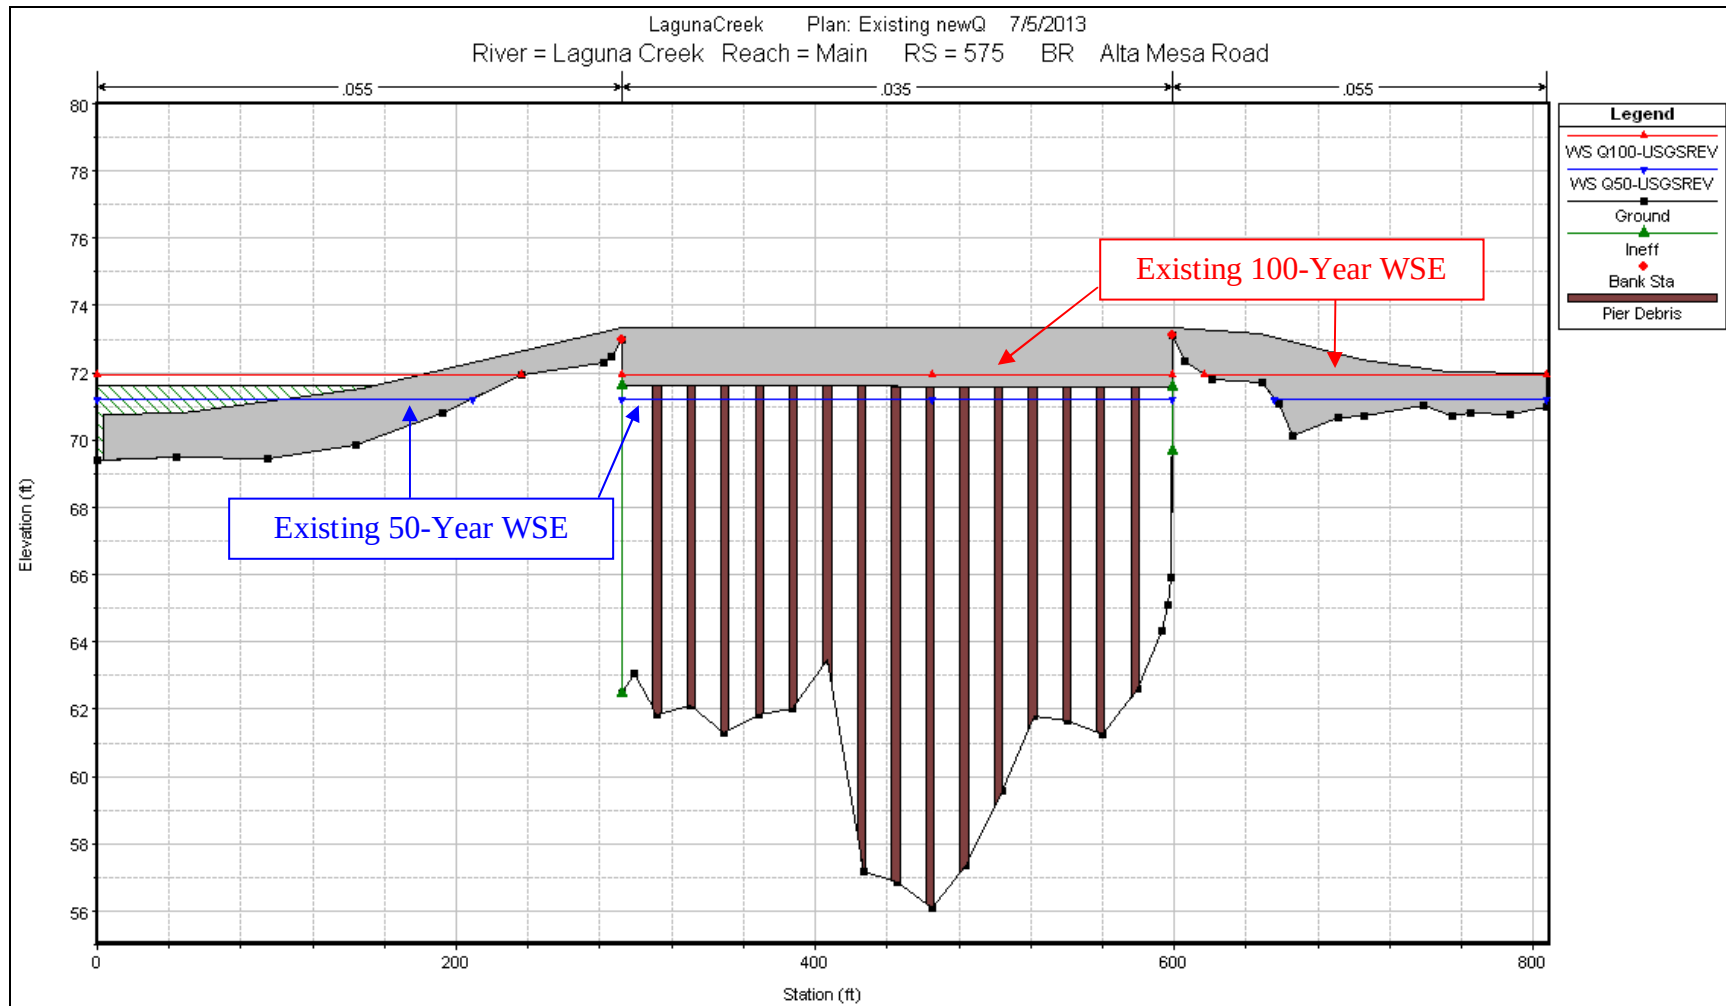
Upstream Face of Existing Alta Mesa Road Bridge over Laguna Creek
